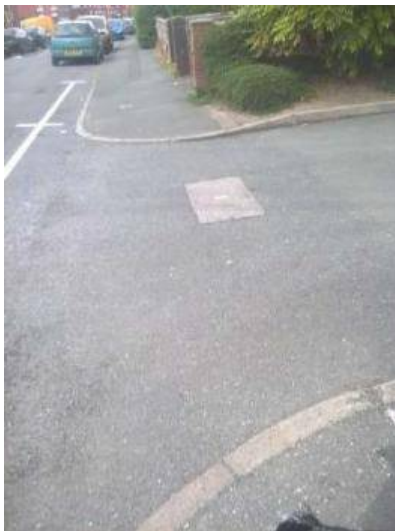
Vehicle access point to parking at residential building on Poyser Street
